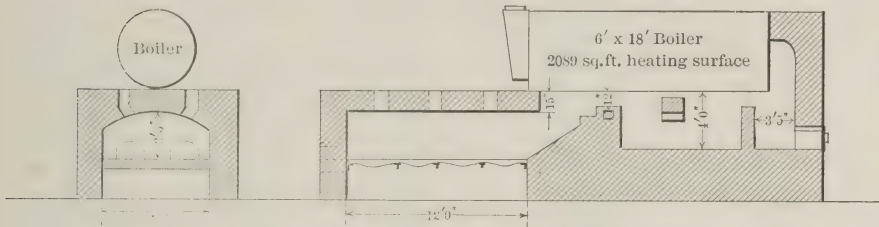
A TAN FURNACE WITH SIX FEED HOLES]
